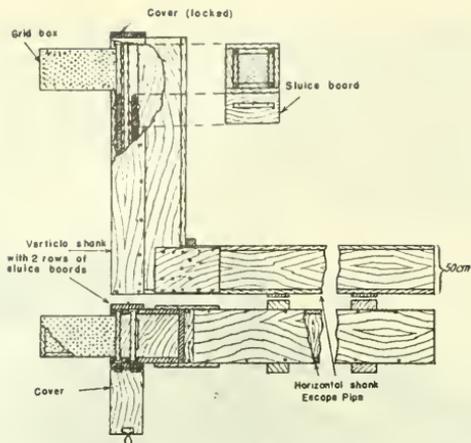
Elevation and plan of a wooden pond sluice. In very wide sluices, the single bottom board and the cover board of the horizontal shank, and the wall of the vertical shank, opposite the sluice boards, may be replaced by little cross boards fitted closely to each other.
